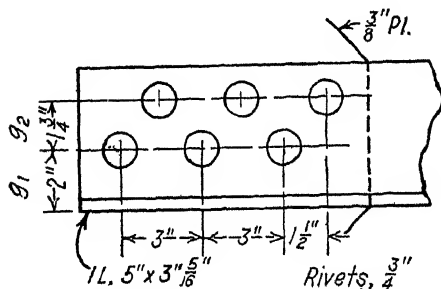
Single-Angle Tension Member with Two Rows of Rivets.
